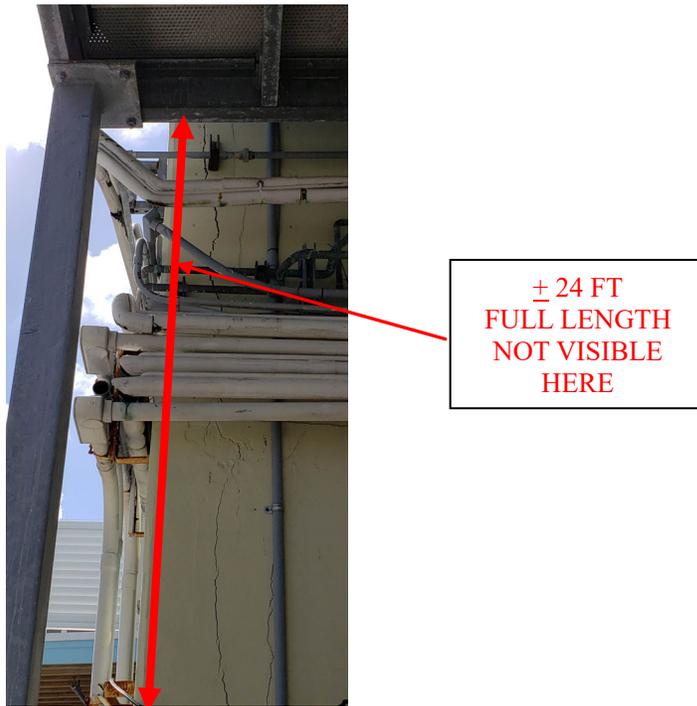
Location 18: Approximately 24 ft long new 16x8 concrete column. See detail 1/S101.
